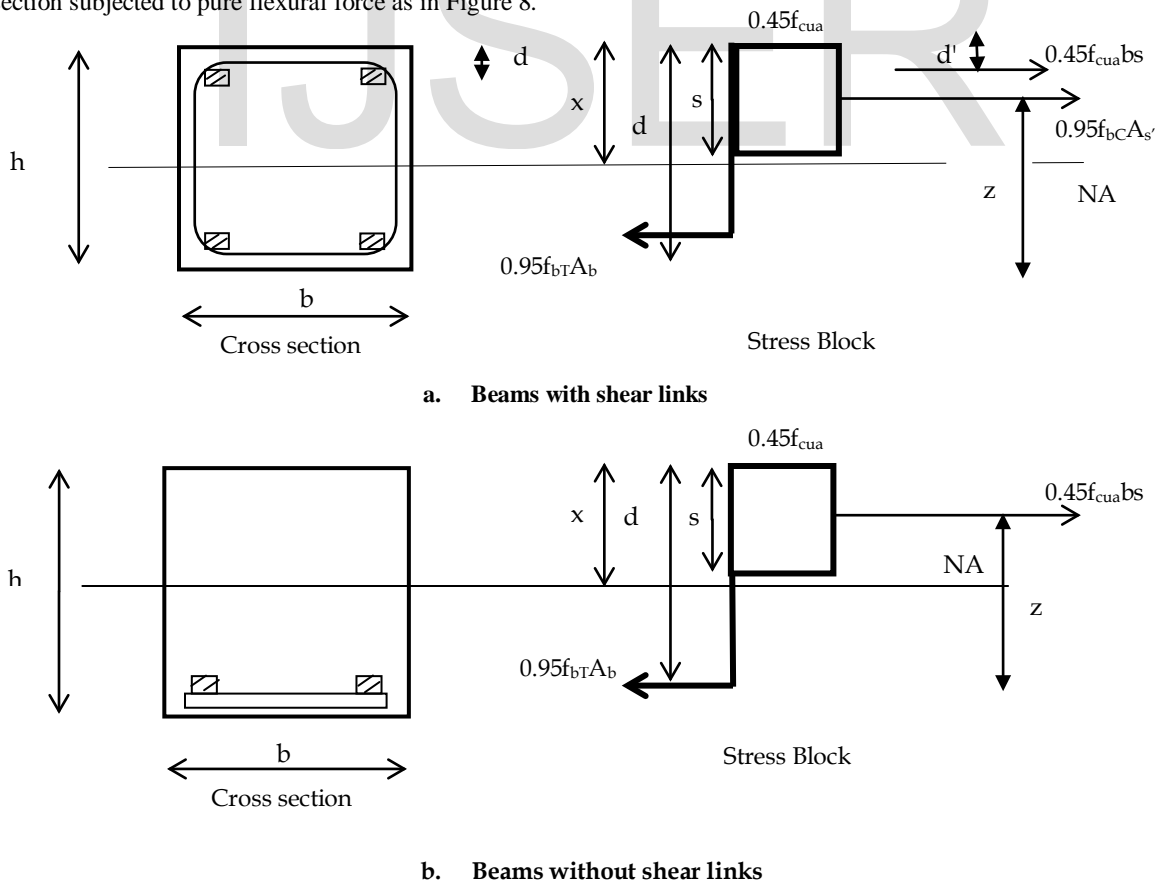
Simplified Stress block for Foamed aerated concrete beams section under Flexural Forces
